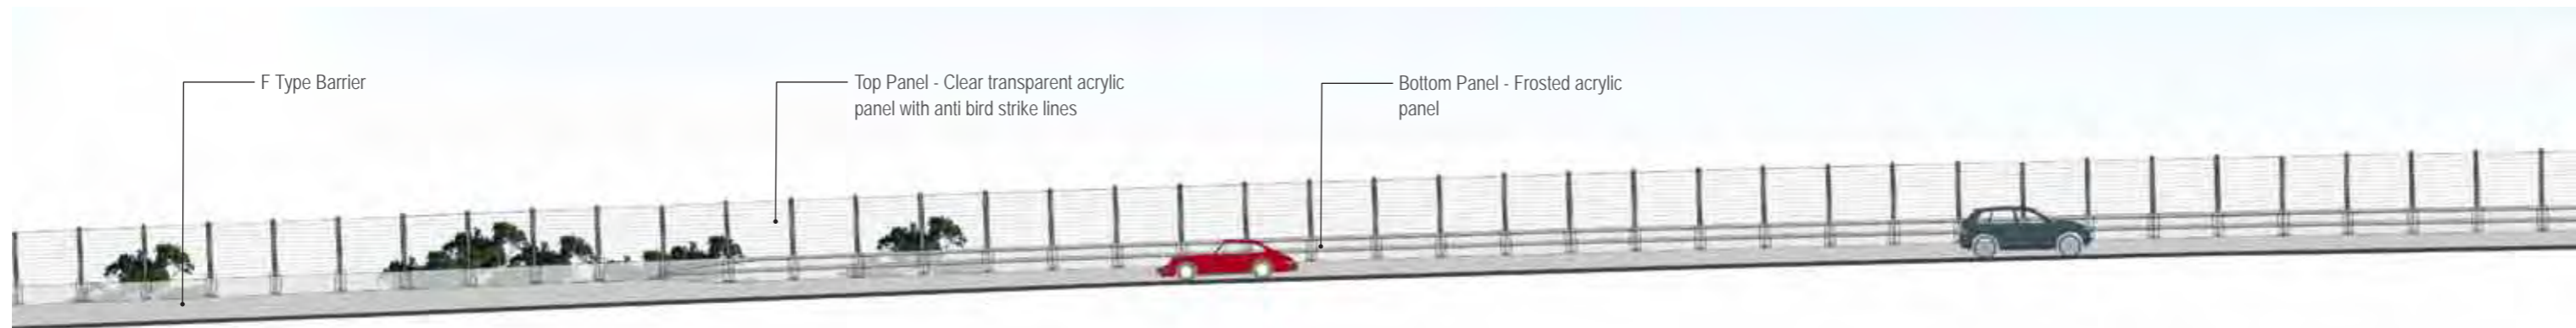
Noise Wall - Elevation (Scale 1:200)
